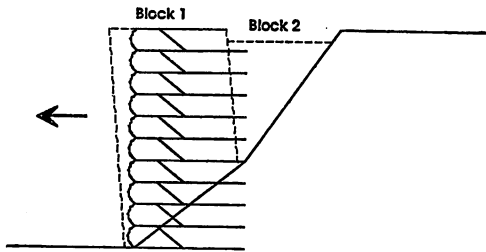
Global internal failure of a reinforced earth retaining structure (type: B-3)
